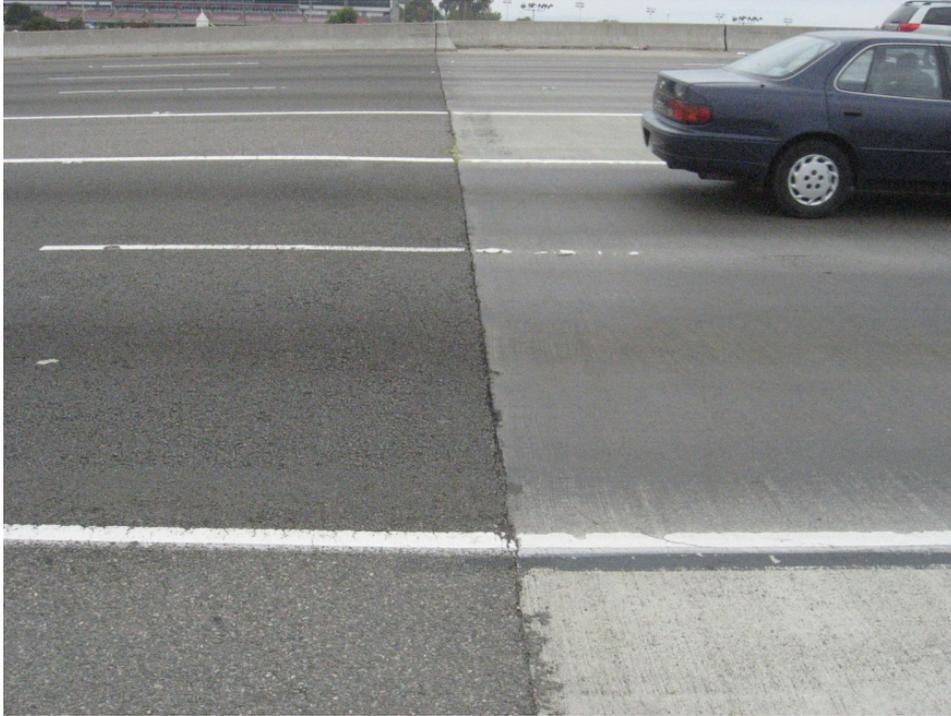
Transition from the pavement to the approach slab on Section QP-118.1.
